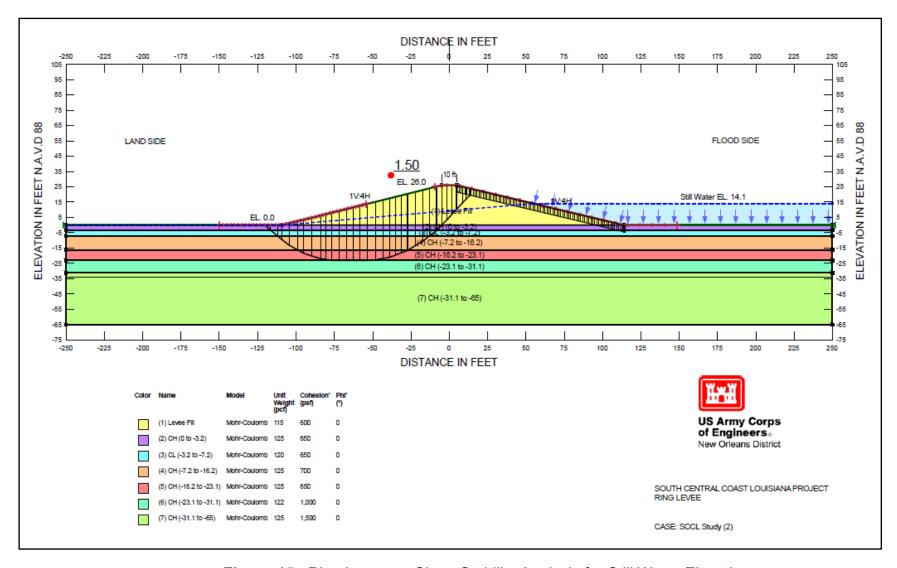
Ring Levees – Slope Stability Analysis for Still Water Elevation.
